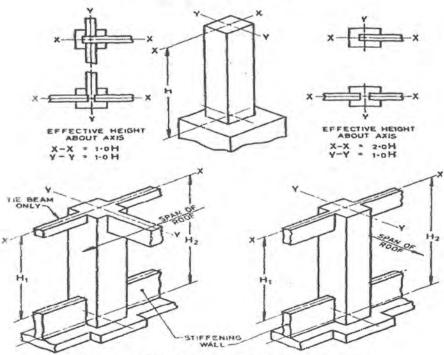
EXAMPLES OF EFFECTIVE HEIGHT OF COLUMNS
